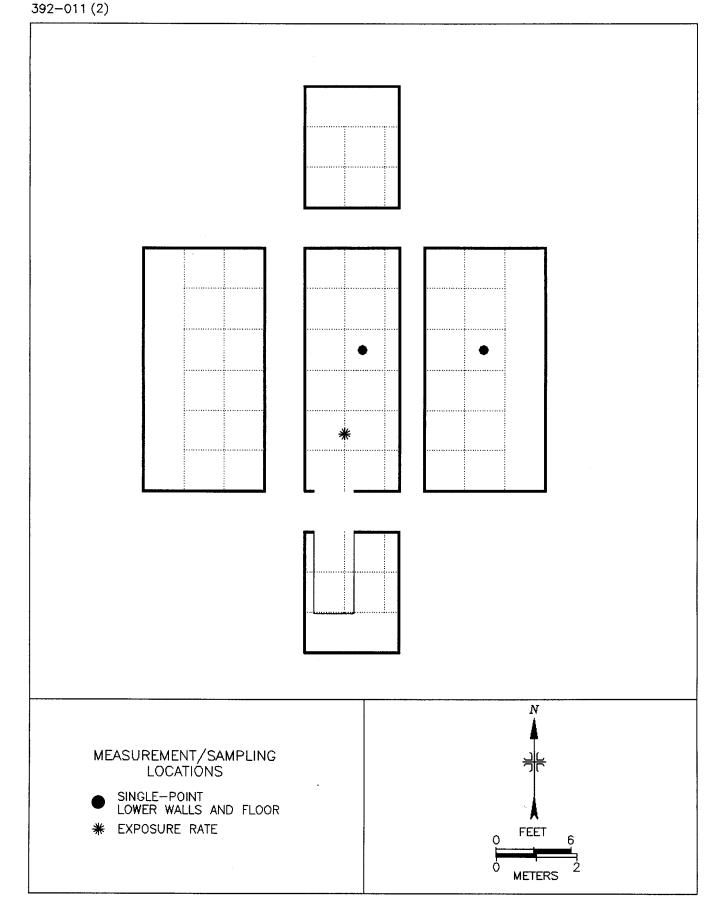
Building T363, Room 100 - Measurement and Sampling Locations
